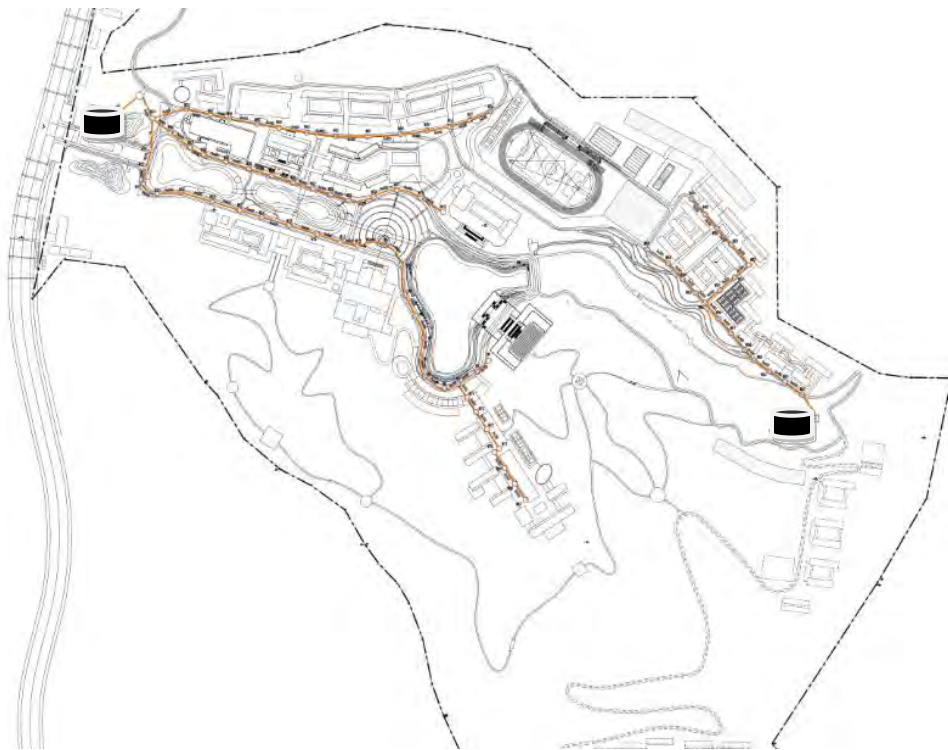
Campus sewer system and on-site wastewater treatment plants
